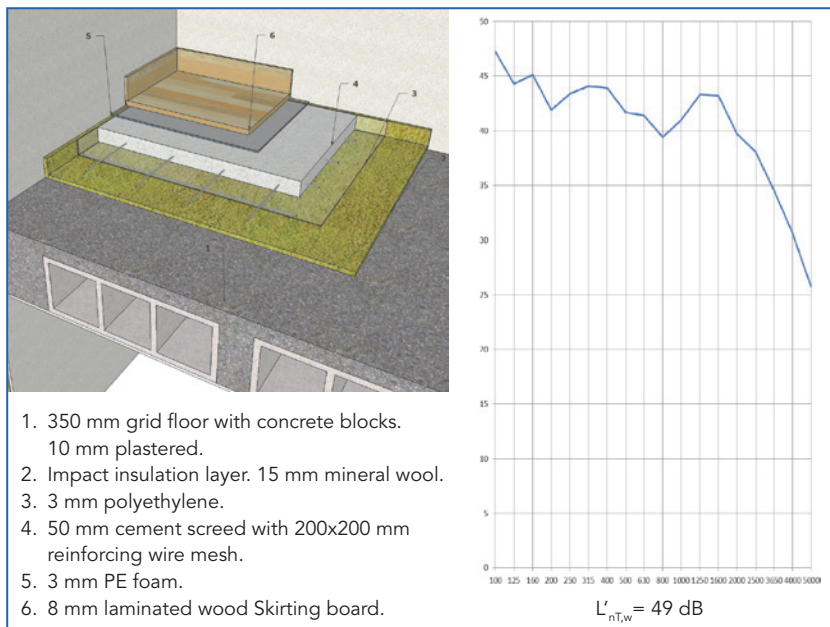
Example of a typical grid floor with a floating floor consisting of a screed on mineral wool [[2] - (Spain)].
